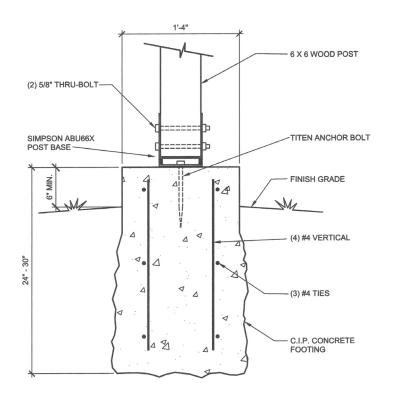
Detail view of page 2, Deck Extension, for the Mid-Level framing plan.
